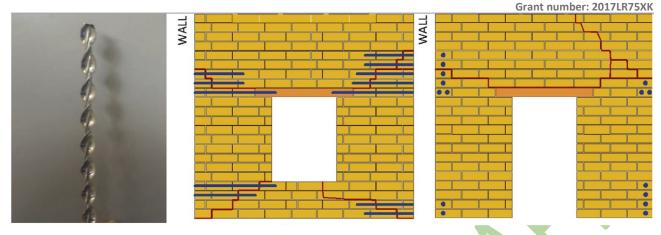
Helical stainless steel bar and horizontal and transversal application of helical stainless steel bars in the masonry wall. Pictures from (Maddaloni et al. 2018).
